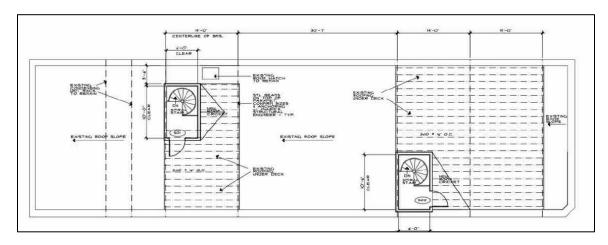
Rooftop plan showing the areas of decking, railing and two stair towers.
